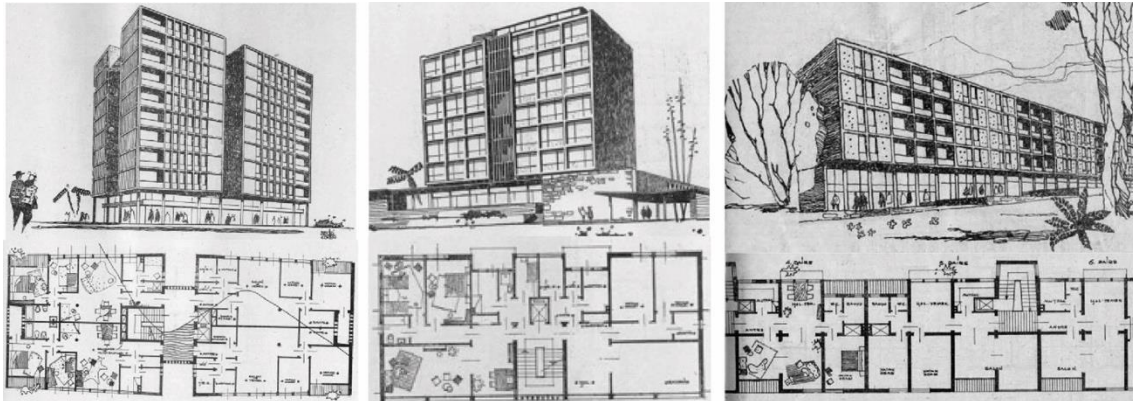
Fourth Levent Neighborhood, sketches, and floor plans
